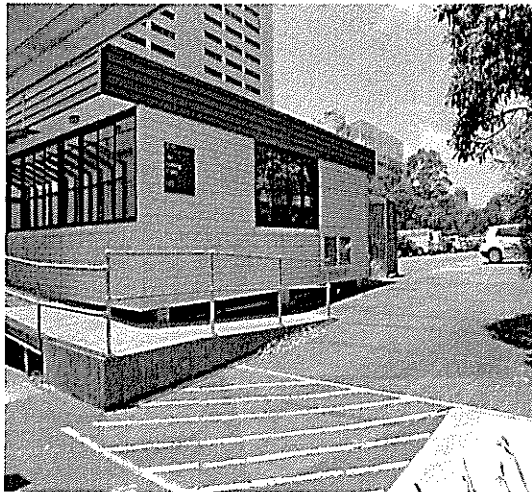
Subject site with western demountable building (left) and open carpark at rear.
